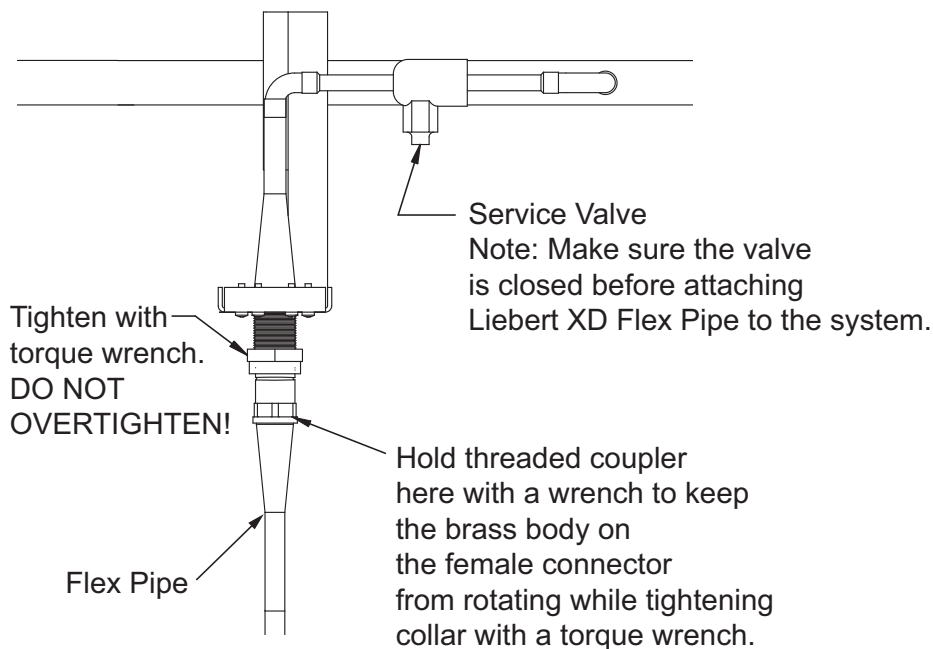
Detail view of Liebert XD Flex Pipe and prefabricated piping port
